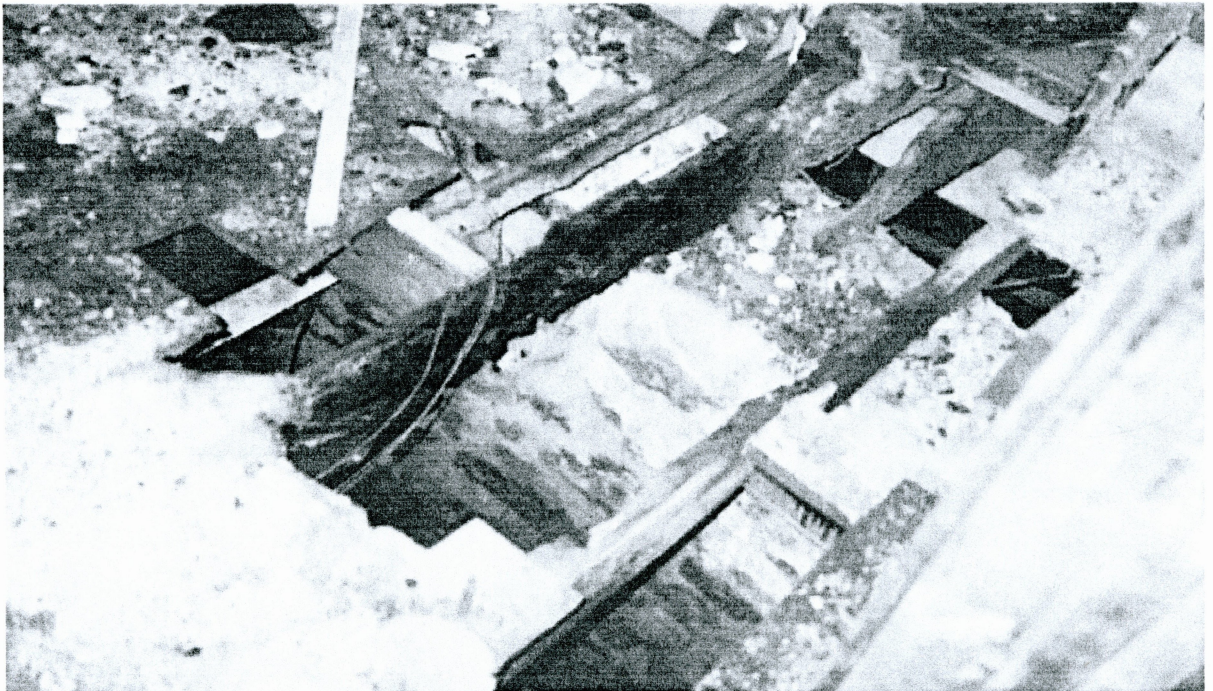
(Basement - Typical timber joist and floor board condition in front section)
